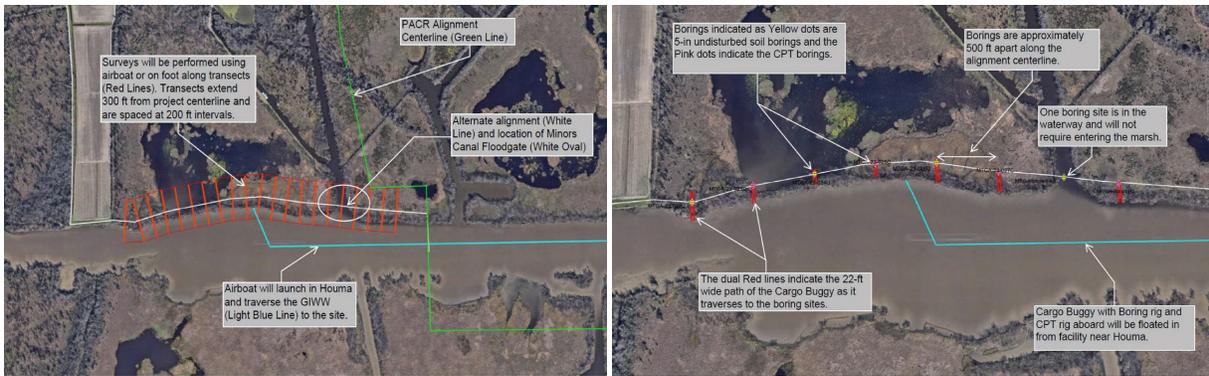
Overview of the Surveys and borings work zone for Minors Canal Floodgate (Alternate Alignment).
